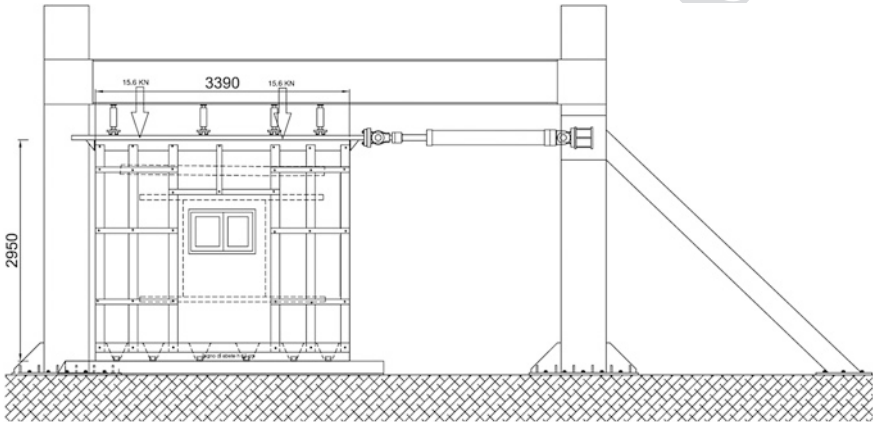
Full-scale specimen of a masonry wall reinforced with a timber frame built according to the Borbone constructive system. Laboratories Ivalsa—CNR
